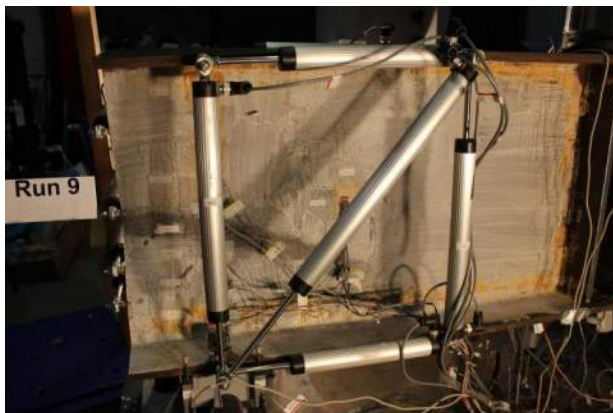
Undamaged Girder Right: +0.25 in
